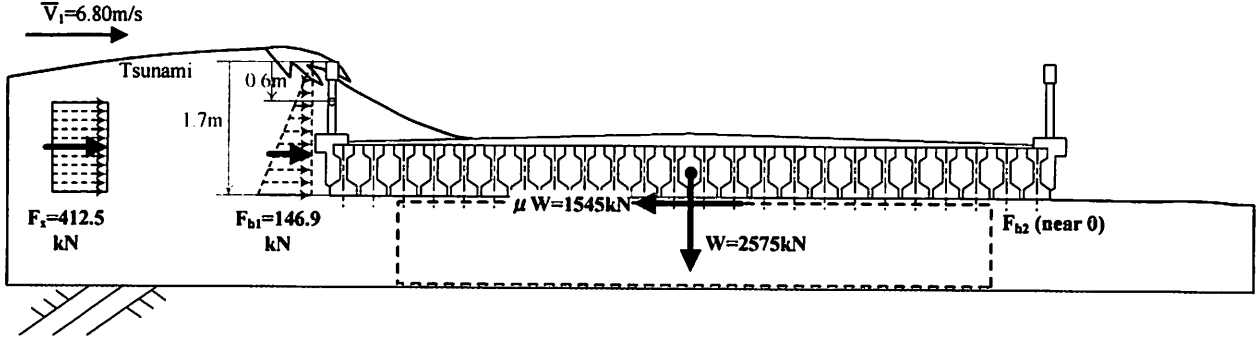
Wave Shape 1 (Tsunami just Impact on Bridge Deck)
